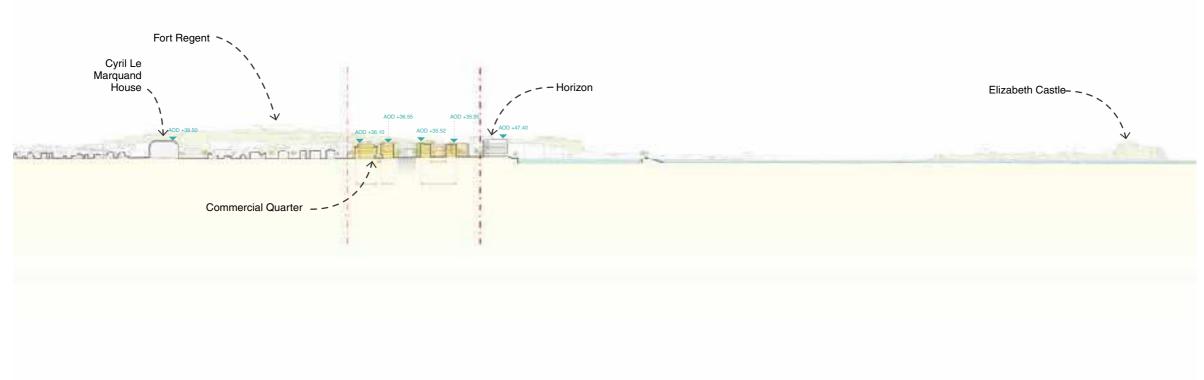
Section through Cyril Le Marquand House, the Site and Elizabeth Castle
